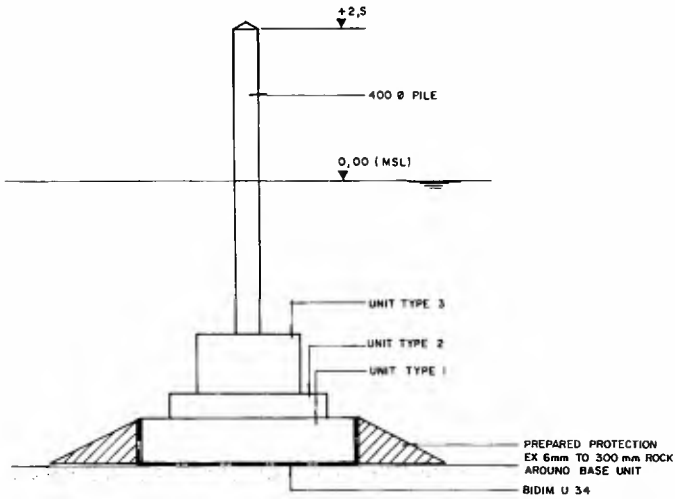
CONCRETE ANCHOR PILES FOR FLOATING JETTIES
